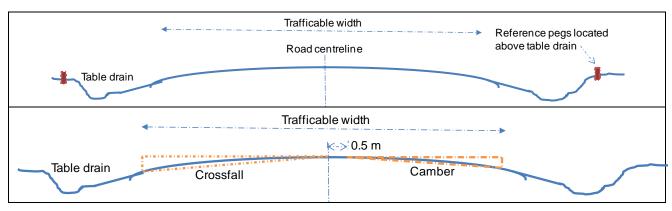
View of typical cross sections of unsealed roads defining crossfall and camber.
